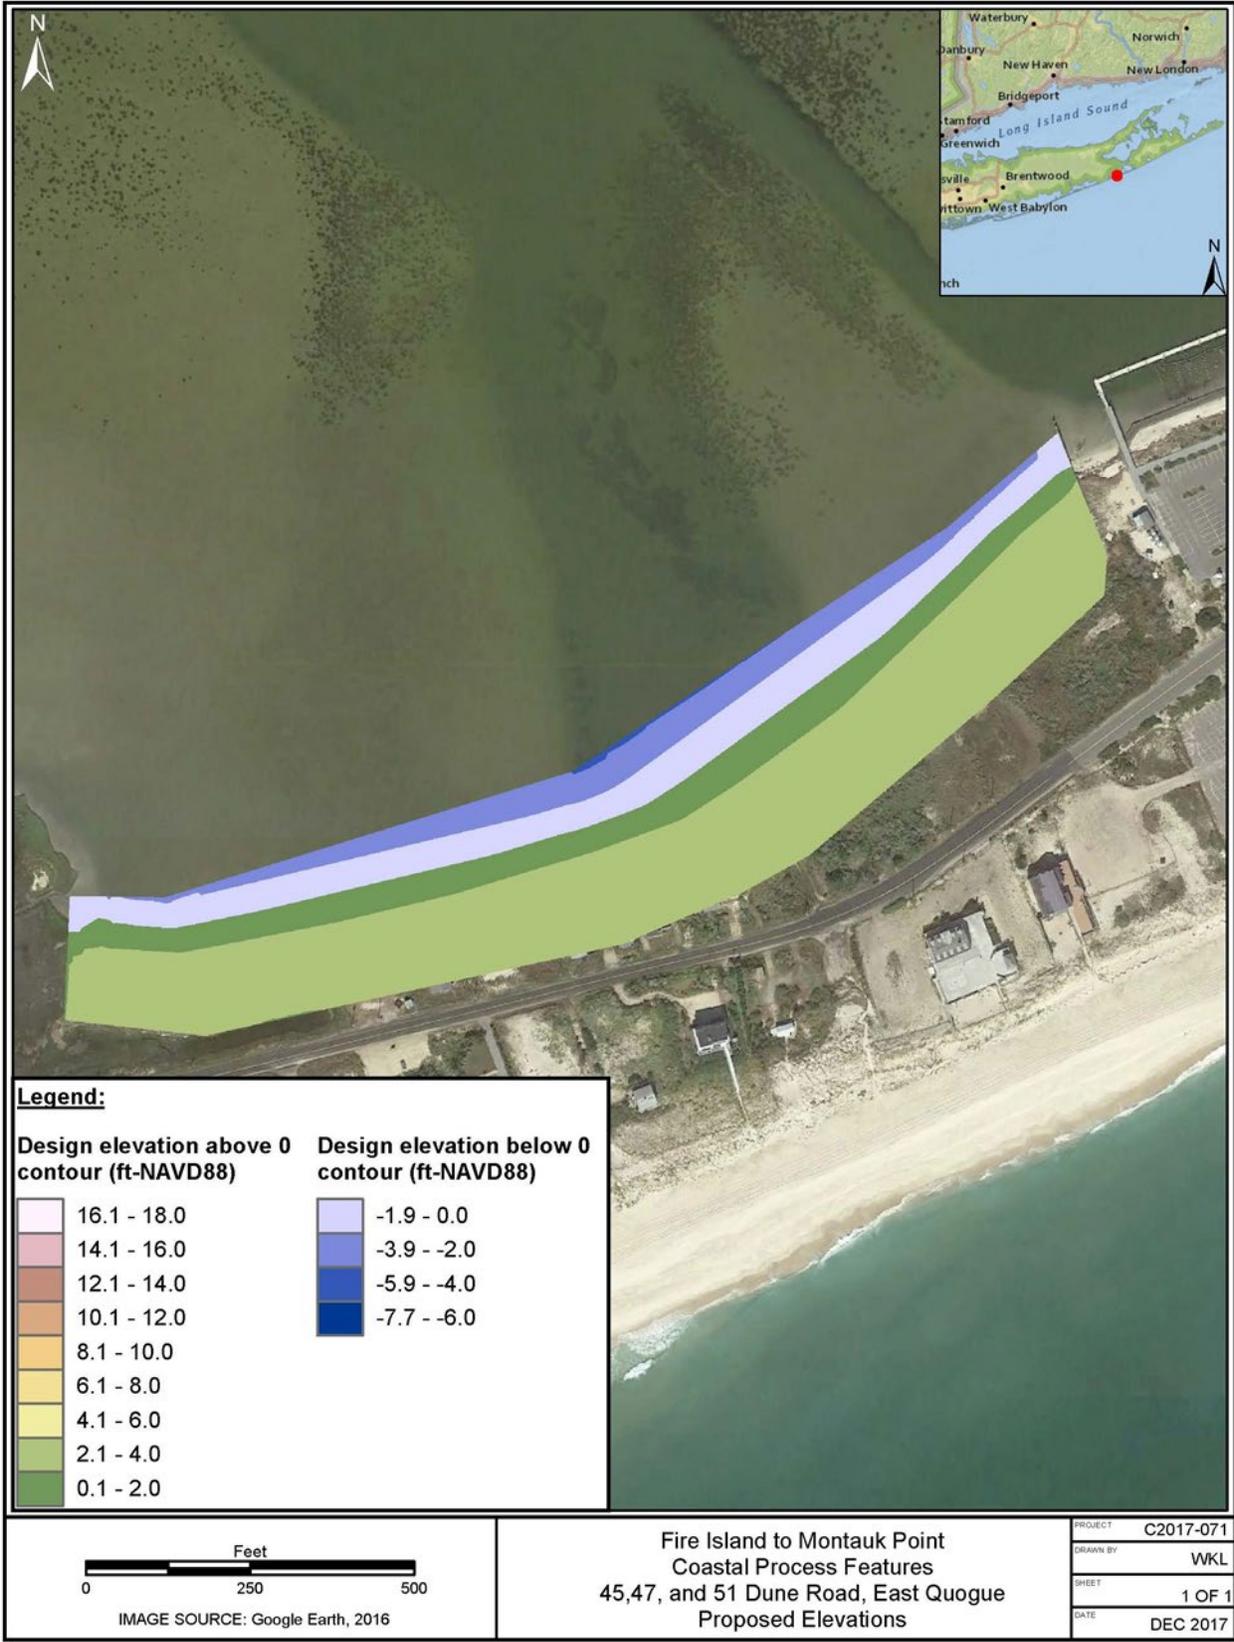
45,47, and 51 Dune Road, East Quogue Proposed Elevations
